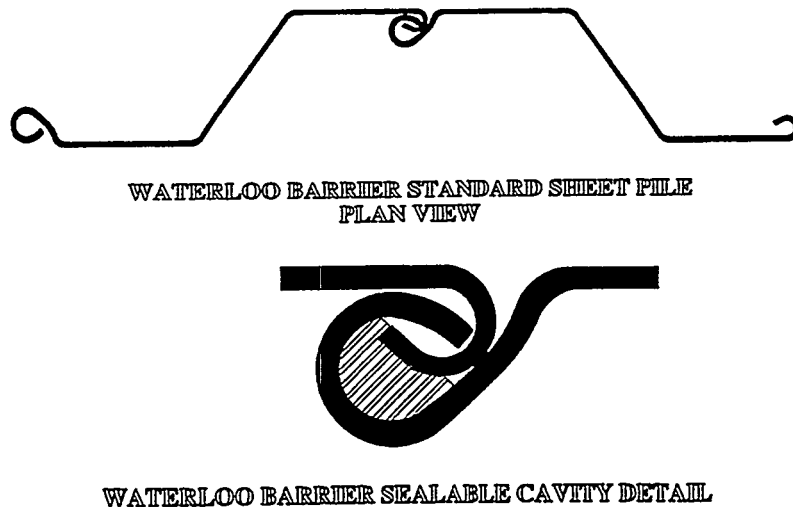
The Waterloo Barrier™ system showing interlocking steel sheet piling and modified joint with the sealable cavity.
